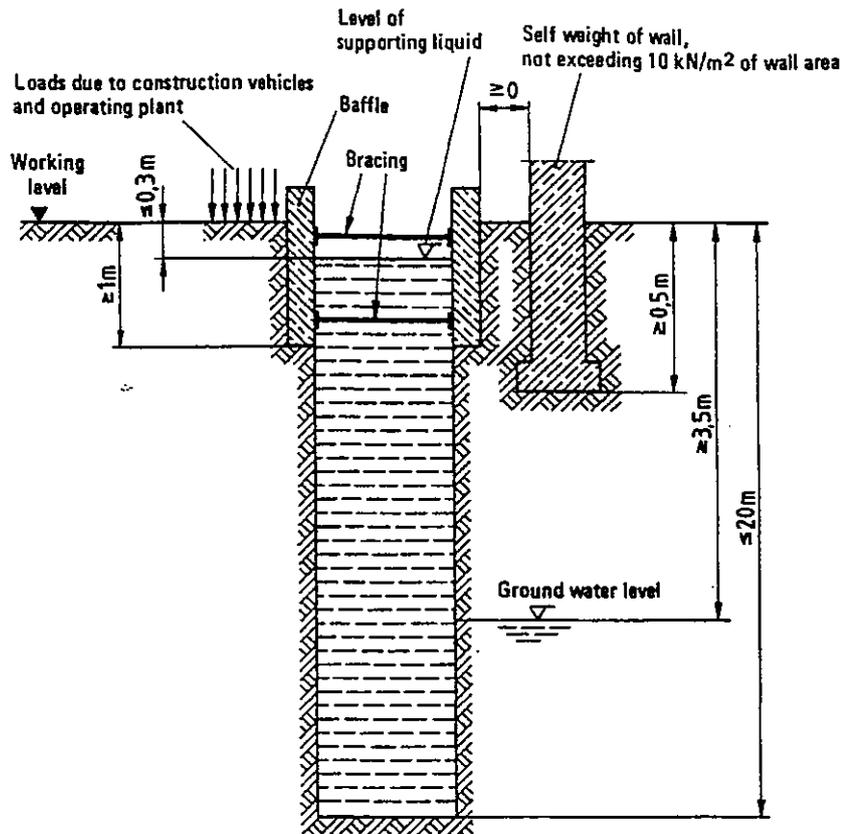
Trenches of length  $l_s$  not exceeding 3,5 m with buildings directly adjoining the trench
